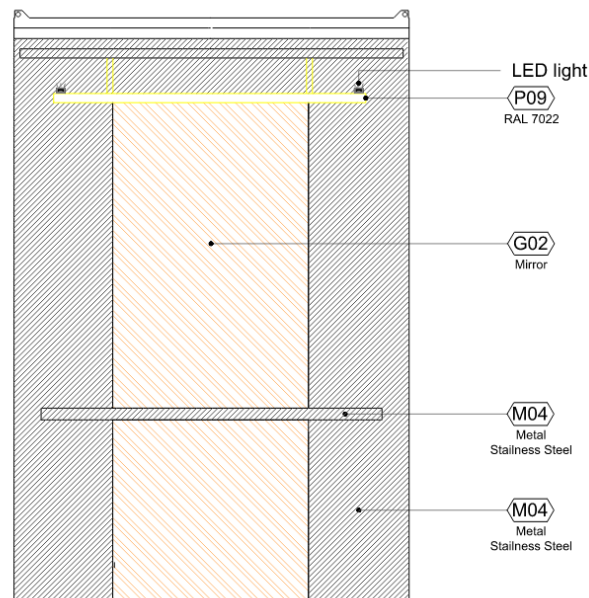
Custom panel design intent for passenger cab (illustrative and de-identified).
